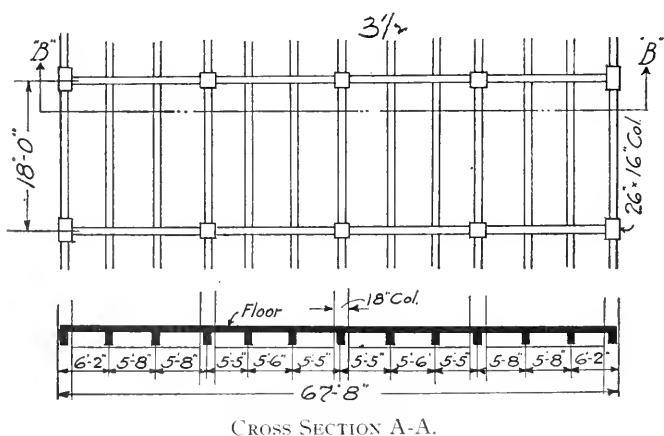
BEAM AND GIRDER FLOOR (SCHEME 2).
